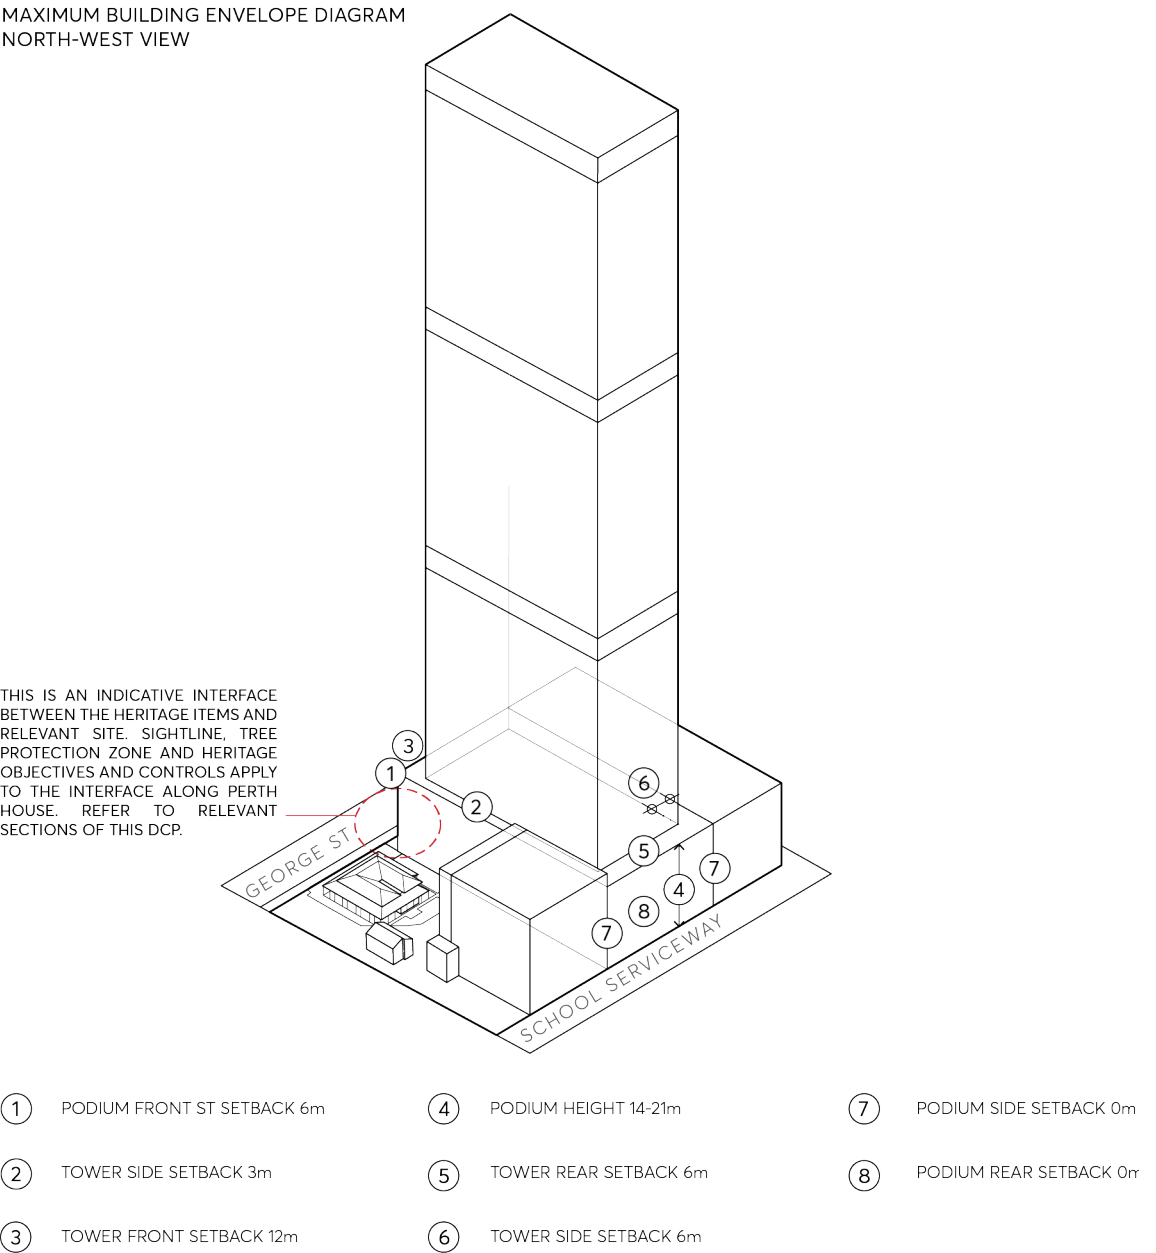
Maximum Building Envelope Diagram, view from North West (Source: Fender Katsalidis Architects)
